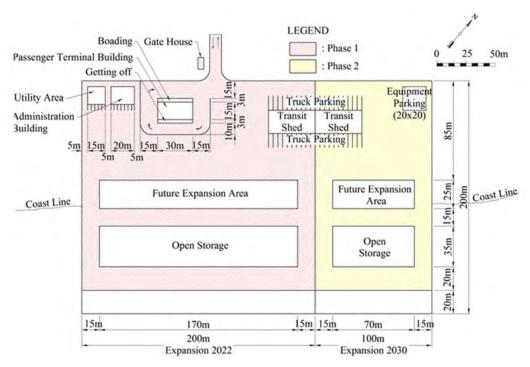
General Layout Plan of New Bongao Port for 2022 and 2030
